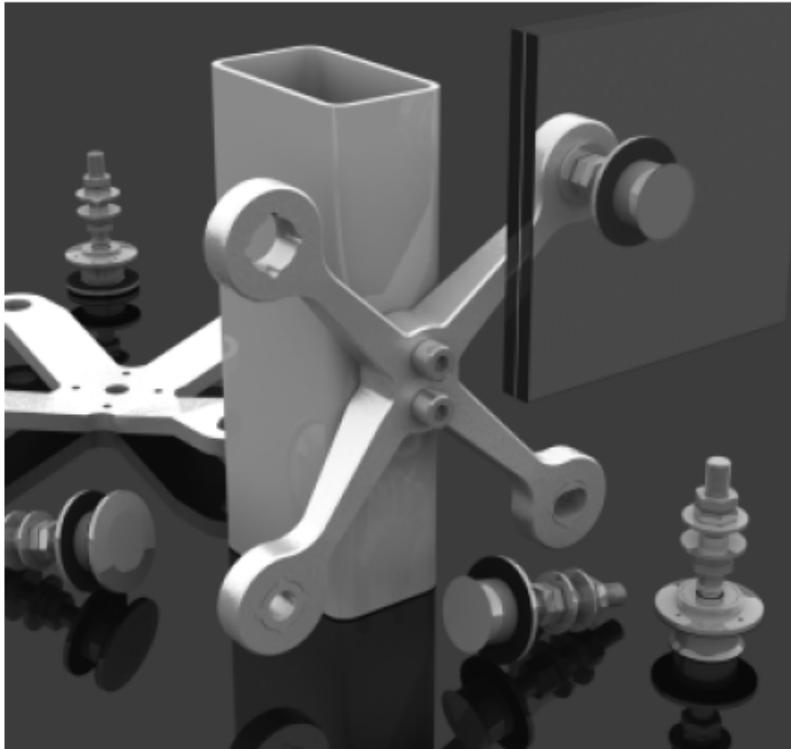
Connection for Point Supported Glass System (Novum Online)
